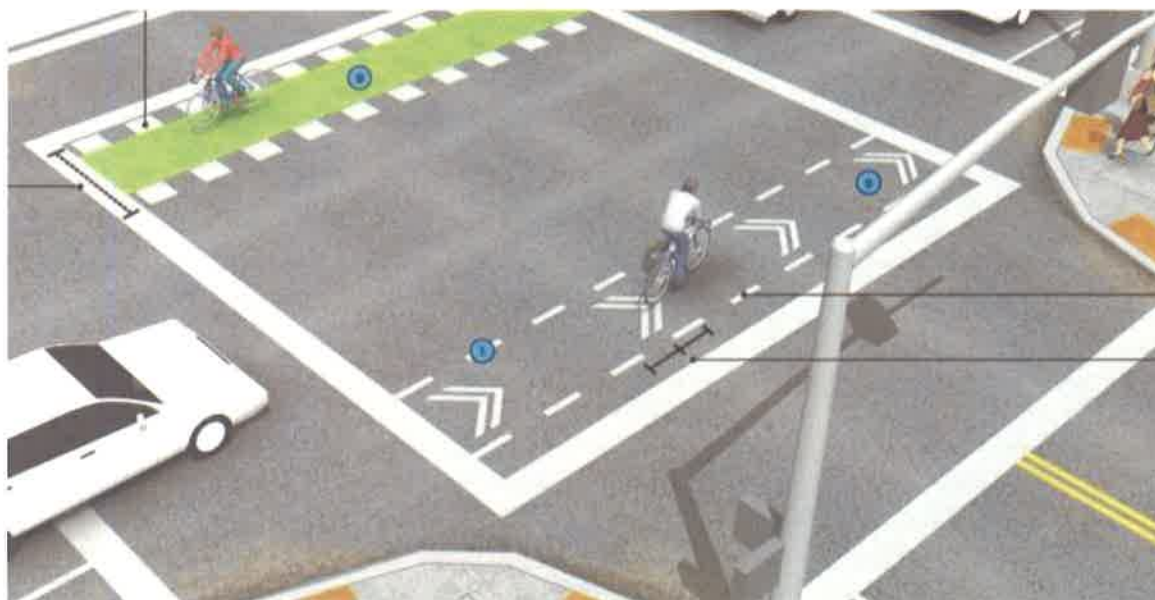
Bicycle Intersection Crossing Treatment (Source: 2011 NACTO Urban Bikeway Design Guide)
